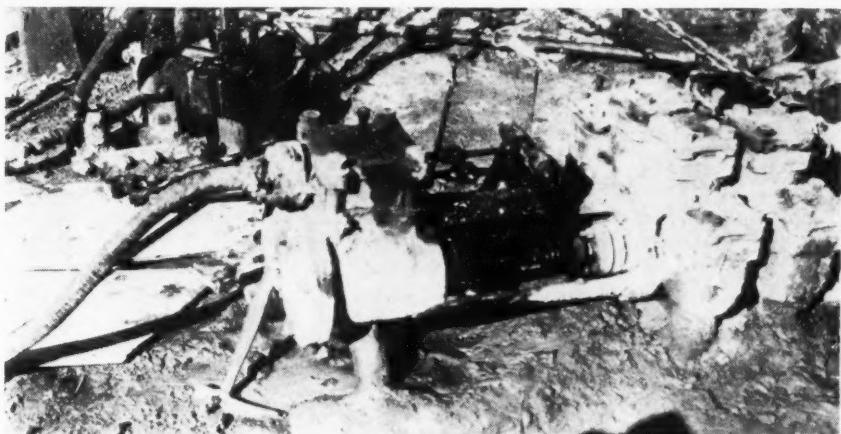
ALL GROUTING was done with this 6 x 4-in. by 6-in. air-driven duplex reciprocating pump. Through this machine passed 40,835 sacks of cement to grout about 12,000 ft. of holes in seamy rock.
